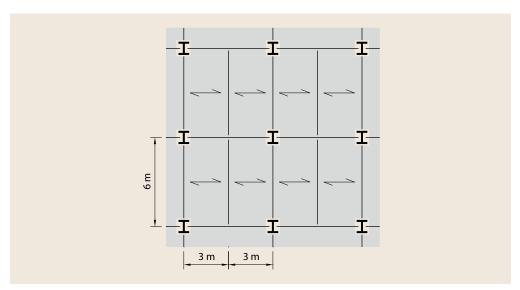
Beam arrangement for 6 m x 6 m column grid
